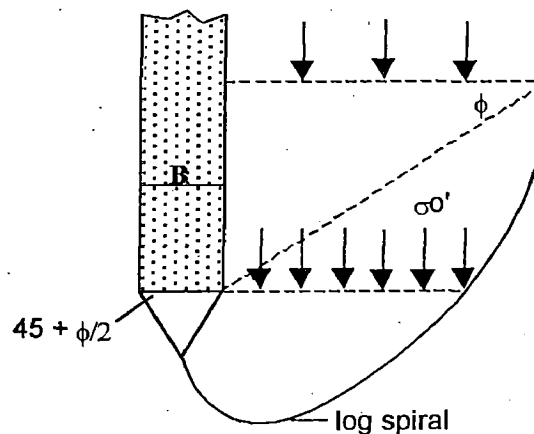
Surface Failure of Deep Strip Foundation (Zeevaert 1983)
